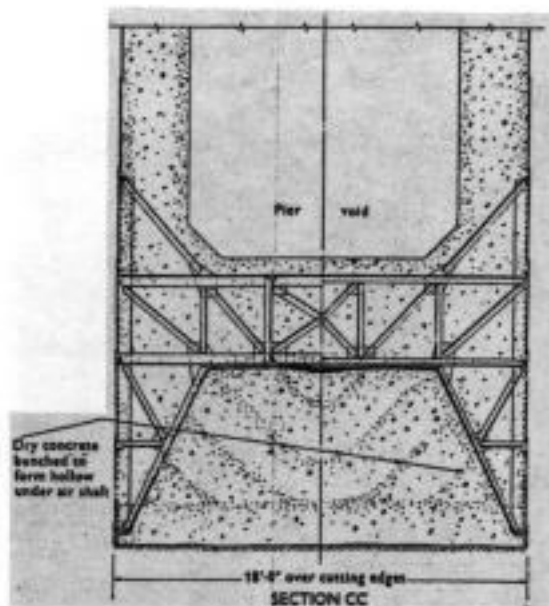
(continued). Typical steel caisson for river pier showing deposition of concrete in working chamber (Wilson and Sully³²)
